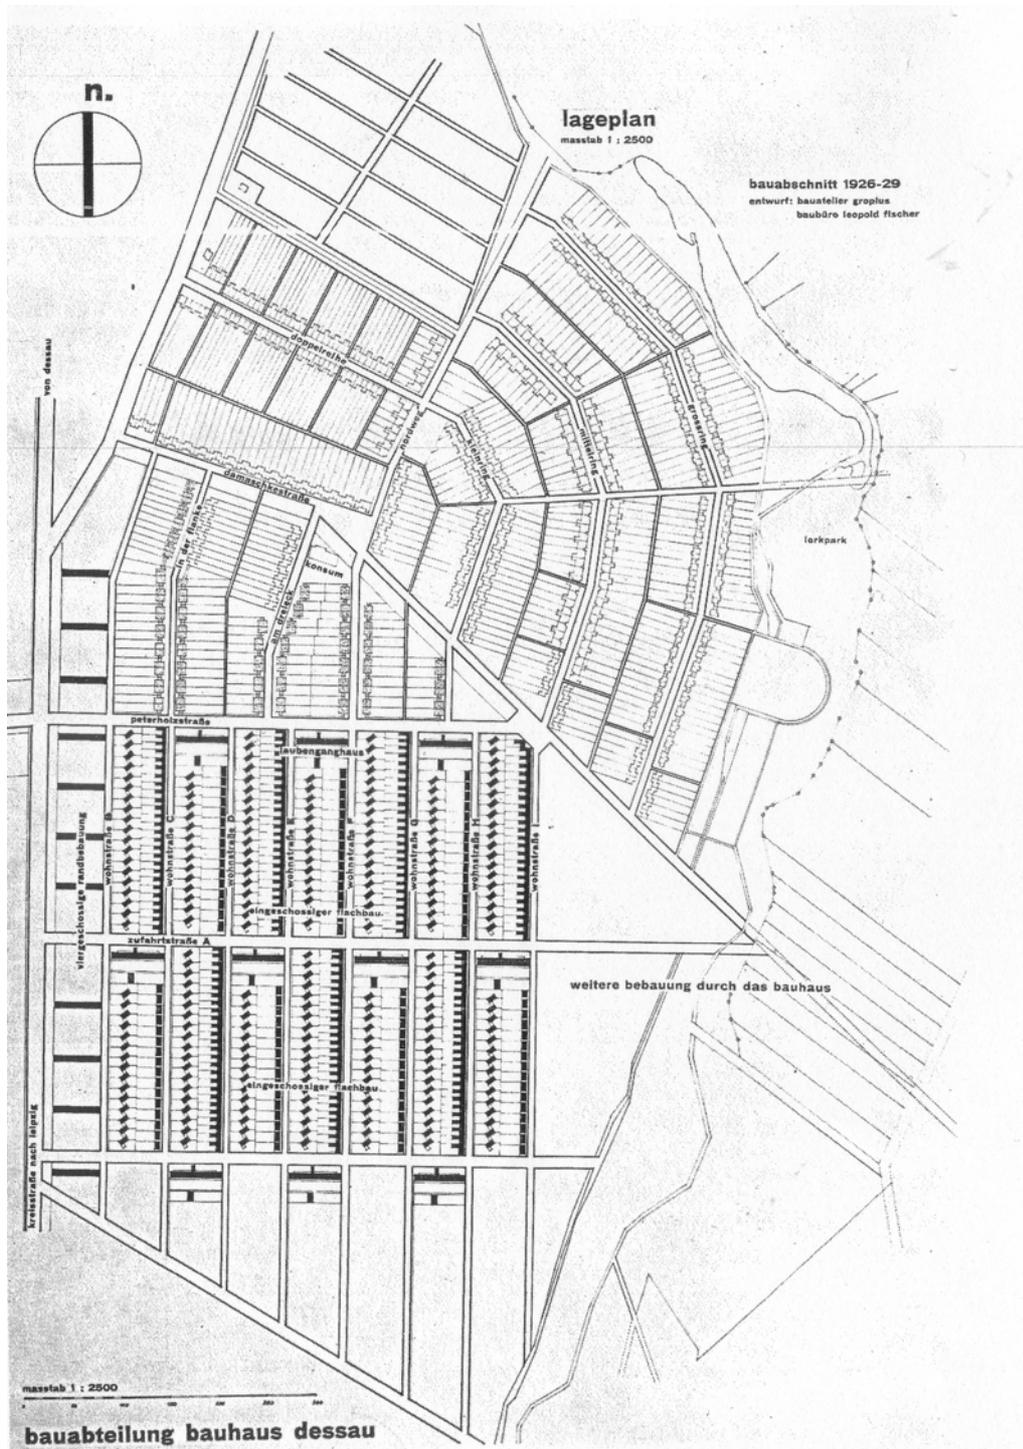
Siedlung Törten, Dessau, 1928-1930- Site Plan
